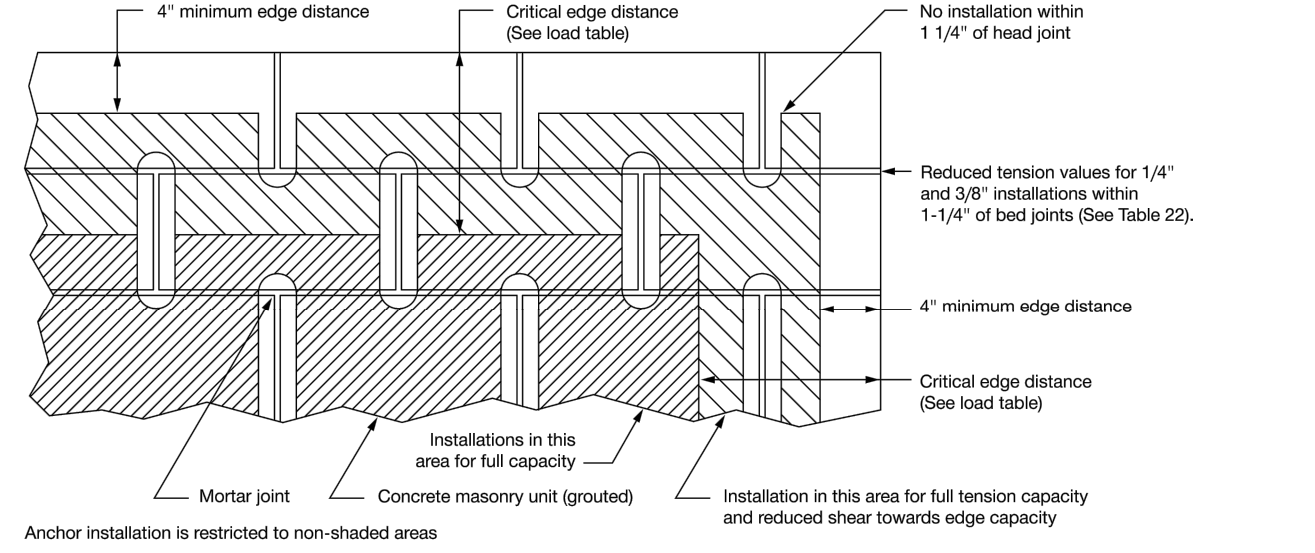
Acceptable locations (shaded areas) for Hilti KWIK HUS-EZ anchors in grout-filled concrete masonry
